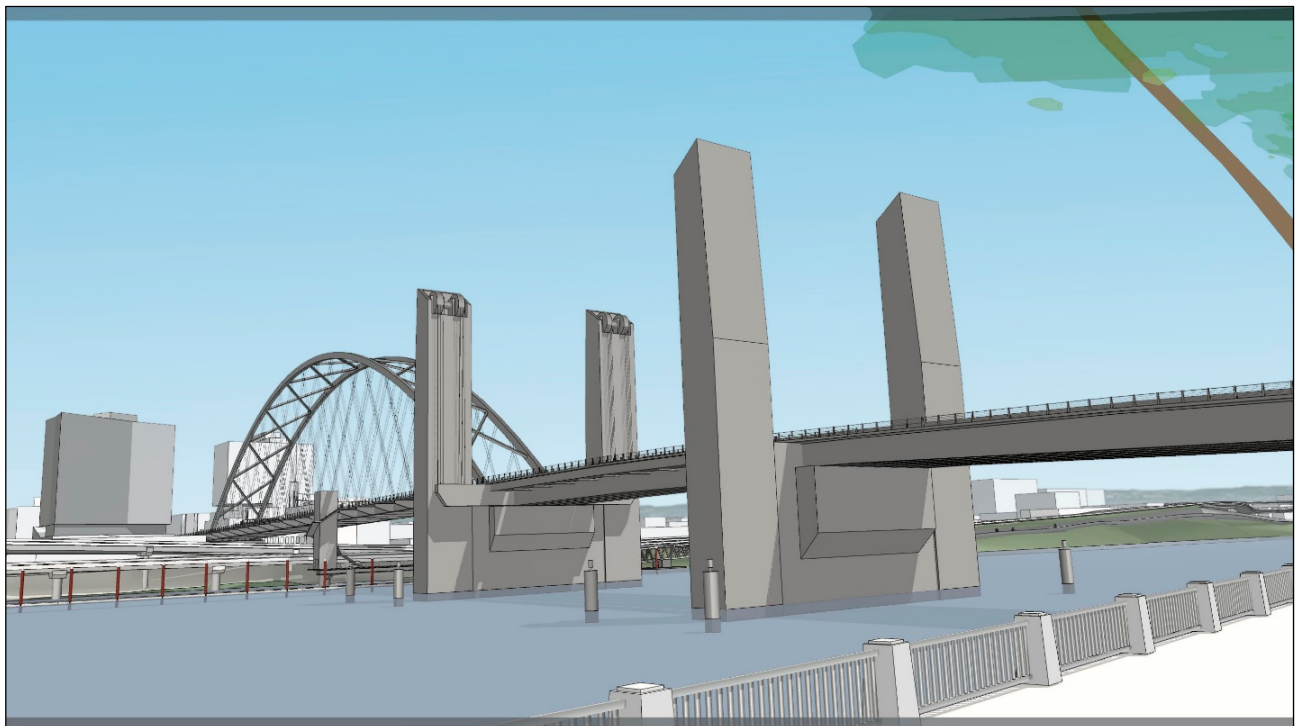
Span Combination 2 (girder west approach, vertical lift central span, tied arch east approach), artist's rendering, view looking southeast (Fat Pencil Studio, 2021).
